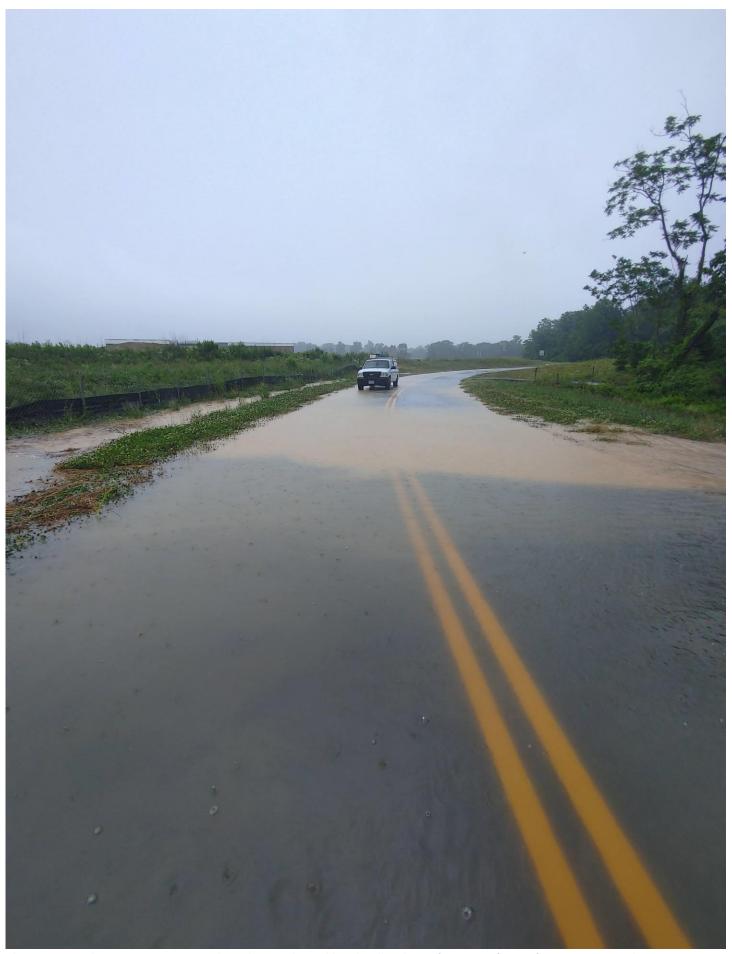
Water sheeting across County Park Road. Drop inlet unable to handle volume of water overflowing from Retention Pond.
